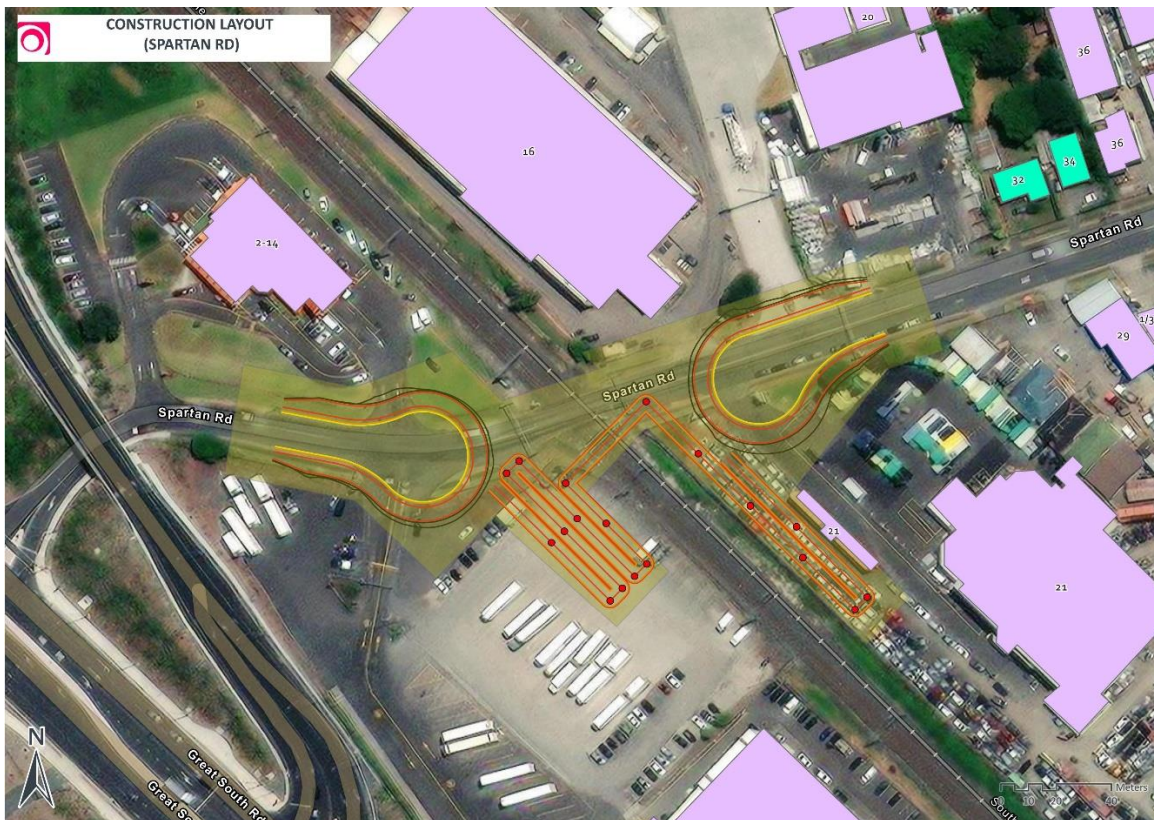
Indicative piling locations and designation overlay (Spartan Road)
